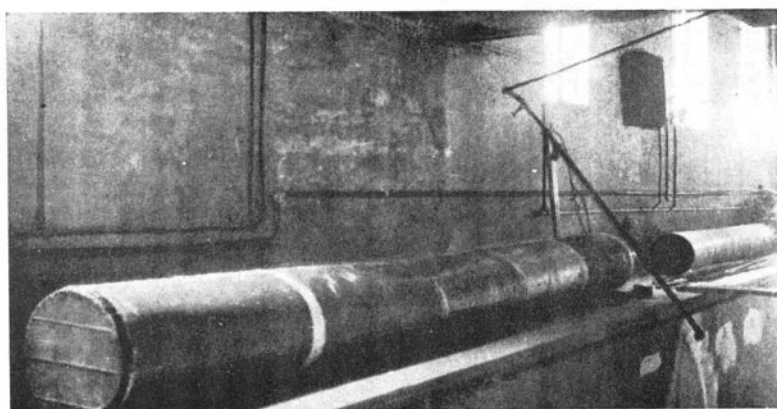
VIEW OF 20-INCH STEEL PIPE AFTER COLLAPSE
